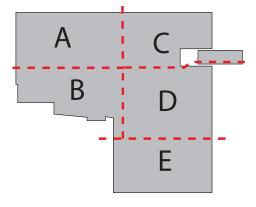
Three-PACT CBOC Prototype L-Shaped Layout Module Overview
